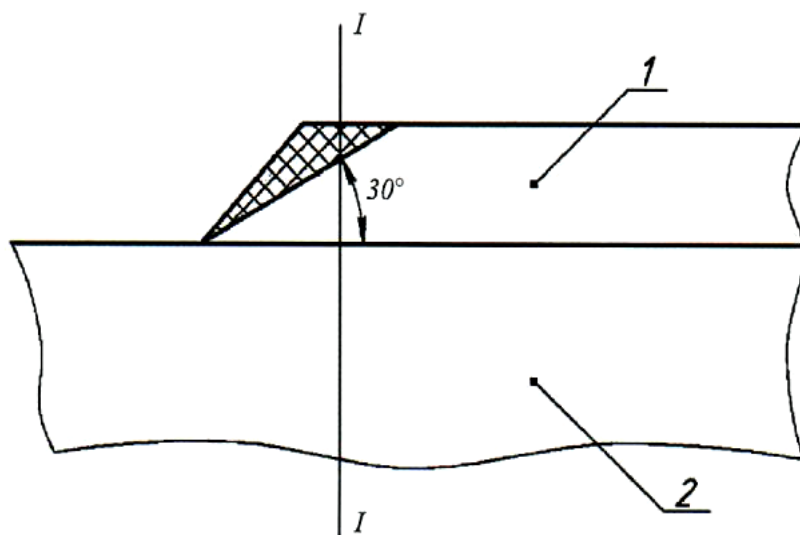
Superstructure area (hatched) not considered in design cross-section ($I - I$) when determine hull girder elements:
